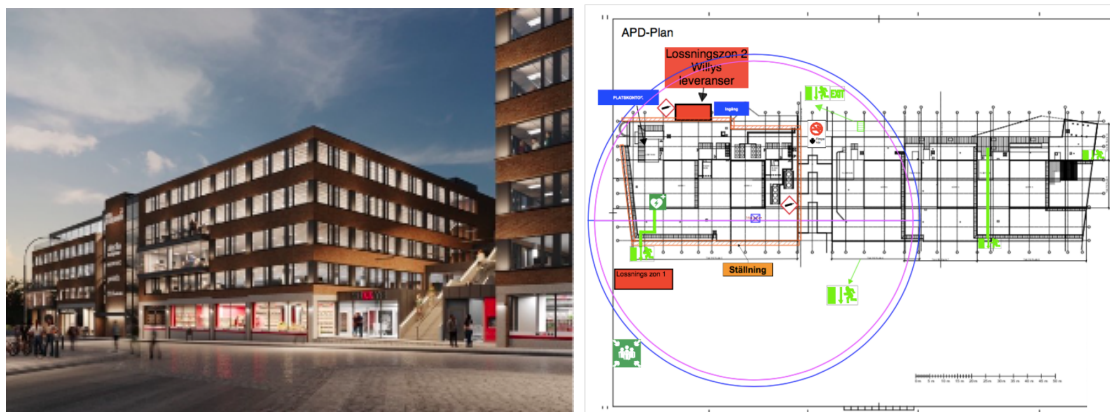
Project C: Digital rendering of the building (left) and WAP of the construction site (right). Images provided by BRA.
